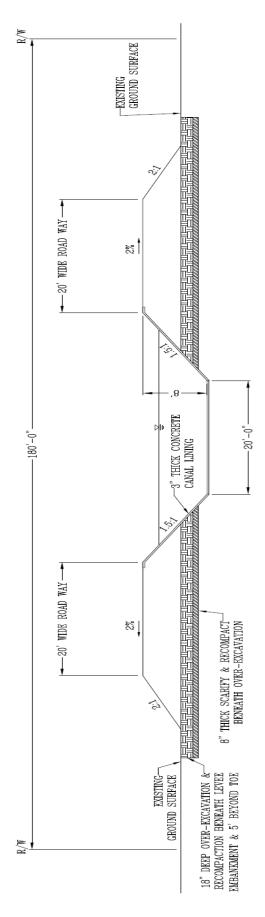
Preliminary Canal Cross-Section with 1.5:1 Side Slopes
